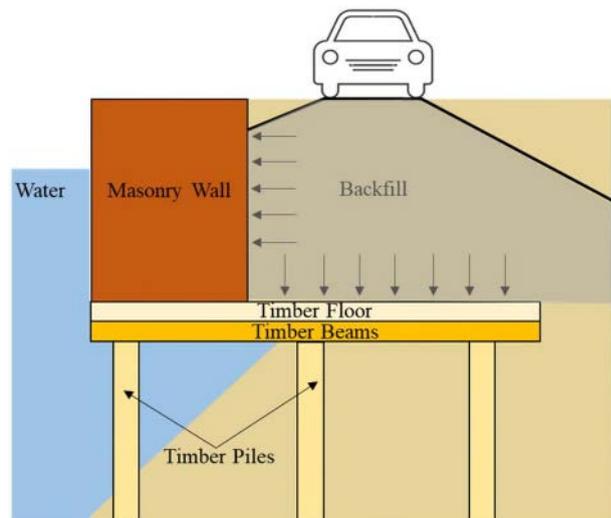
Schematic of a typical historic masonry quay wall (adapted from [11])
